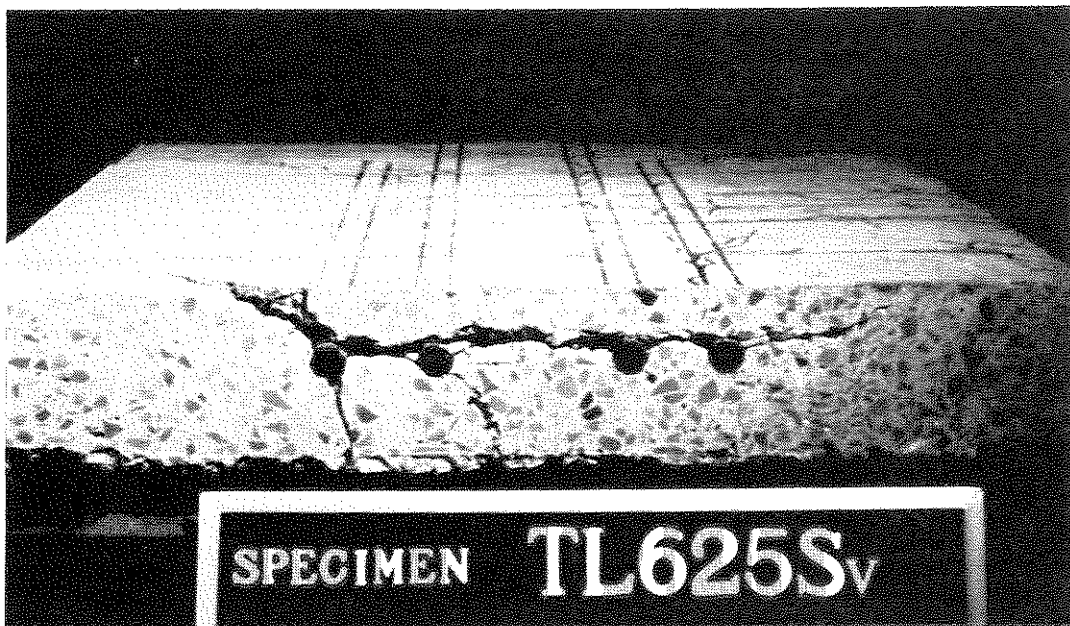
In-plane cracking of specimen TL6-2-5Sv.
